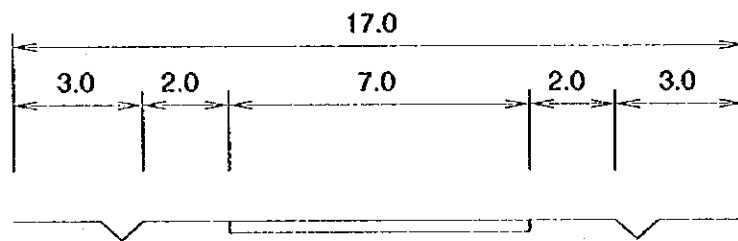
Road Section -2 (From Rio Chame to Chame Center)
